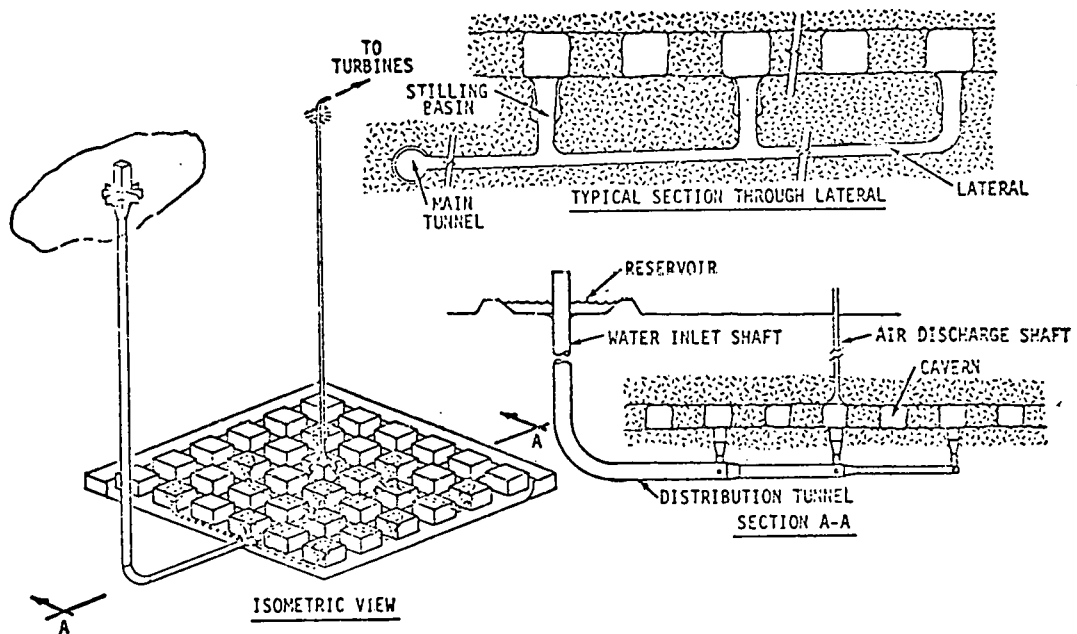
CONCEPTUAL ROOM AND PILLAR COMPRESSED AIR STORAGE CAVERN
